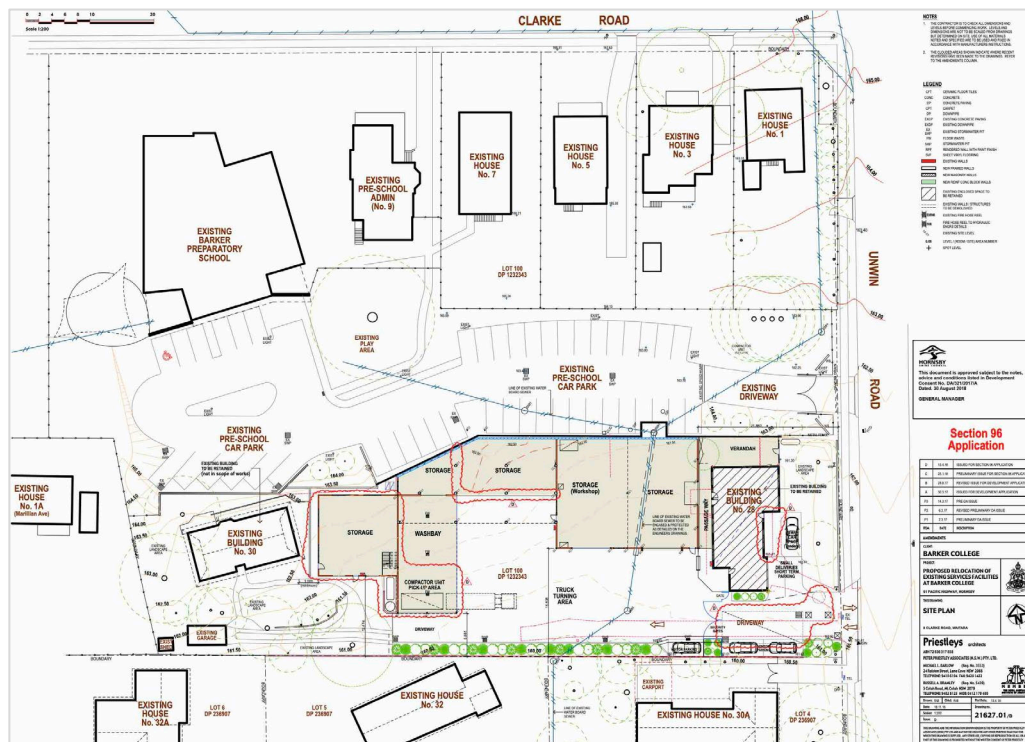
Approved site plan submitted with Section 96 application for DA/321/2017, showing the proposed new double storey building at 28A Unwin Road, Wahroonga. Plan prepared by Priestleys Architects, dated 18 November 2016, revised March 2017. (Source: Hornsby Shire Council, DA Tracker)¹⁶³
